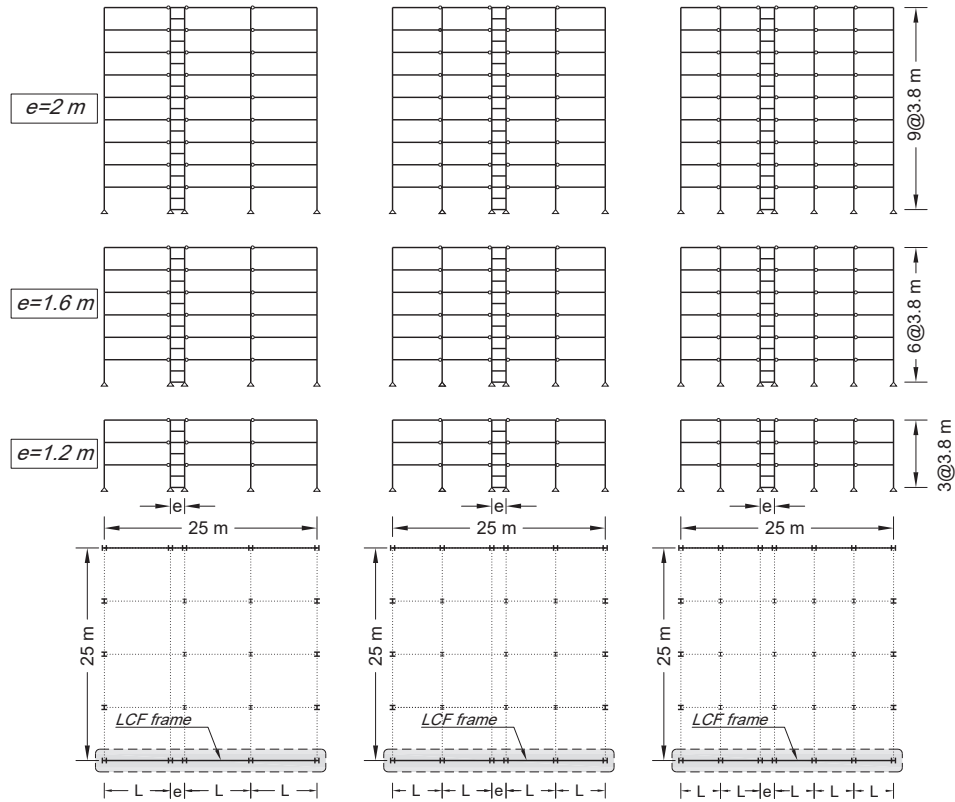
Floor plan of prototype structure and elevation view of the 3-, 6- and 9-story frames
